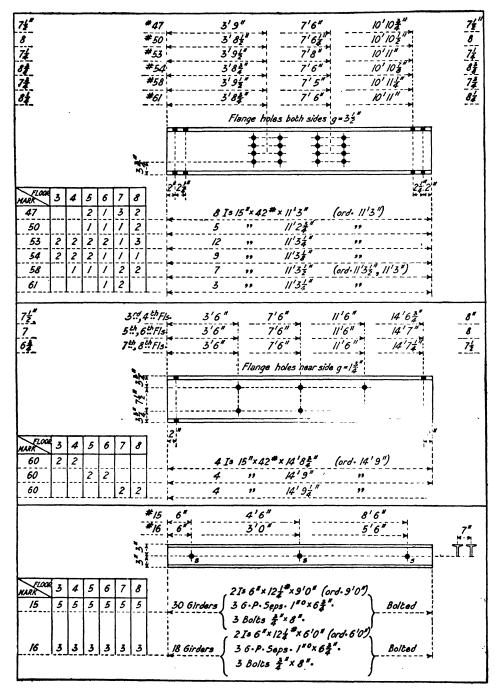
DETAILS OF FLOORBEAMS FOR A STEEL OFFICE BUILDING.
